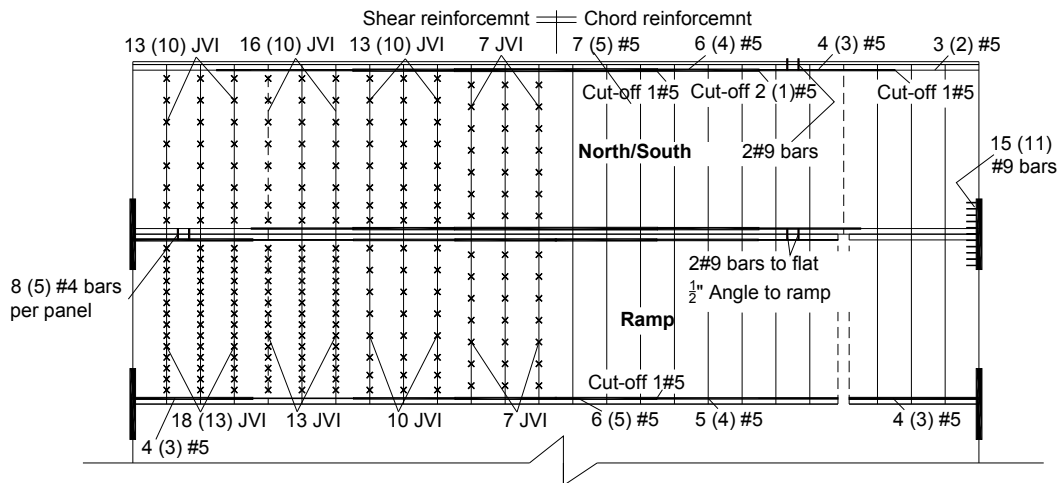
Diaphragm reinforcement design for design example 1C.
